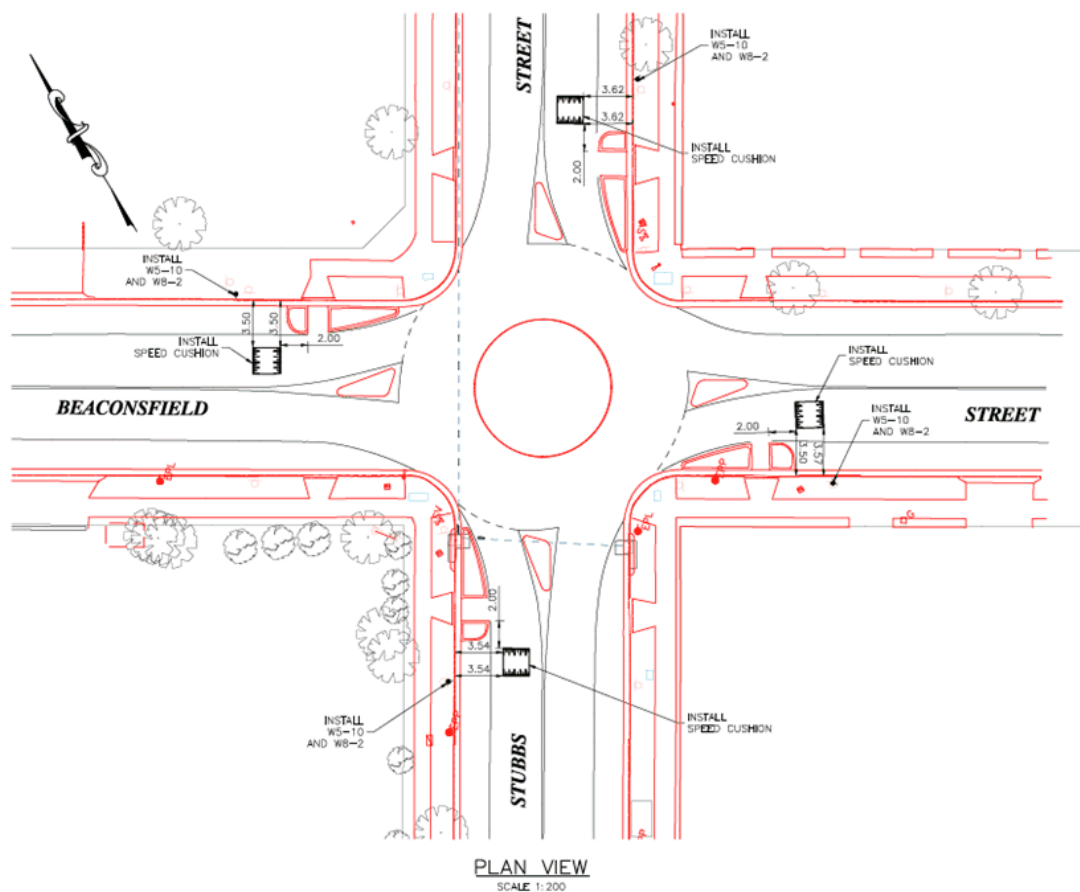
Design plan for the intersection of Stubbs Street and Beaconsfield Street, Silverwater
